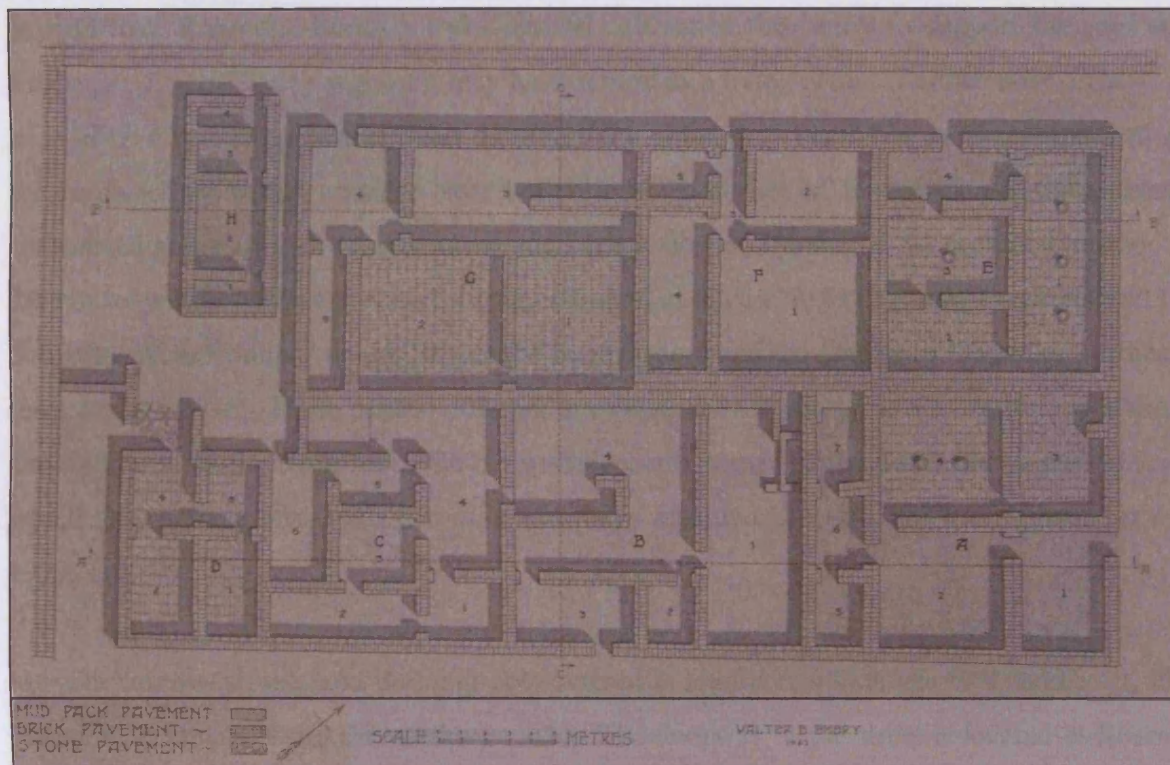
Block C Plan, (after Emery, *et al.*, 1979, Plate 22).
